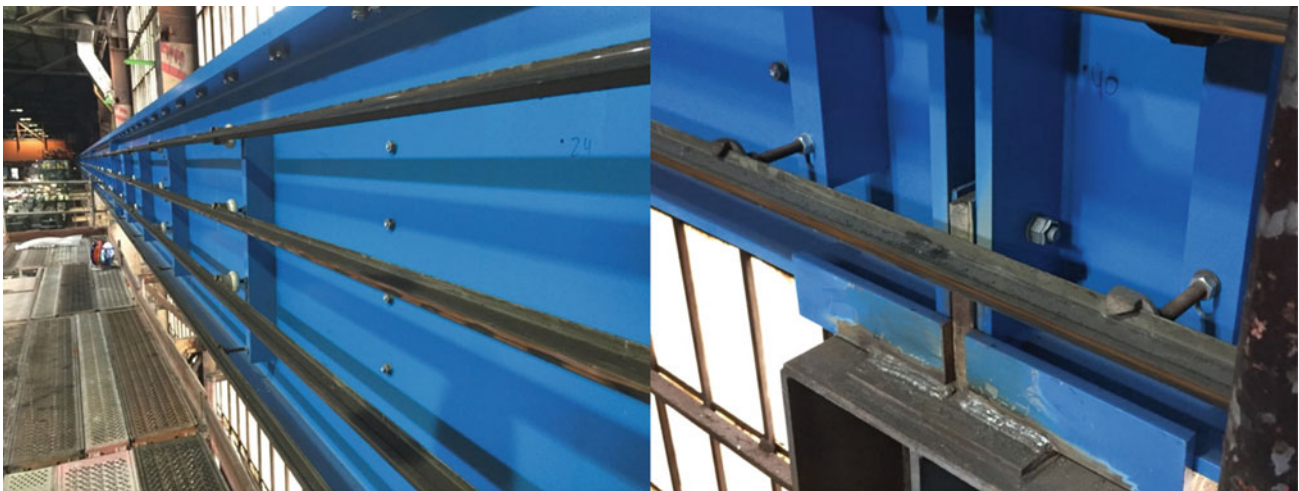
Left – tested runway beam installed on its final position. Right – detailed view of the bolts between runway beams and downshop conductor fittings around DOFs 40 and 53
